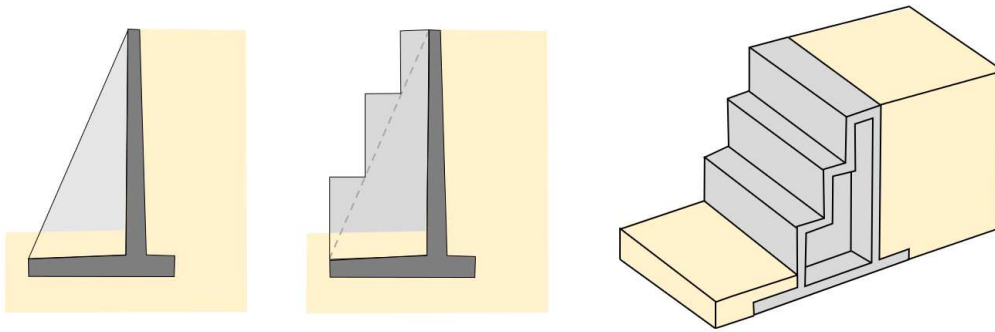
Typical cantilever retaining walls with buttresses / External shape of buttresses with steps at Wadi Cascade/
